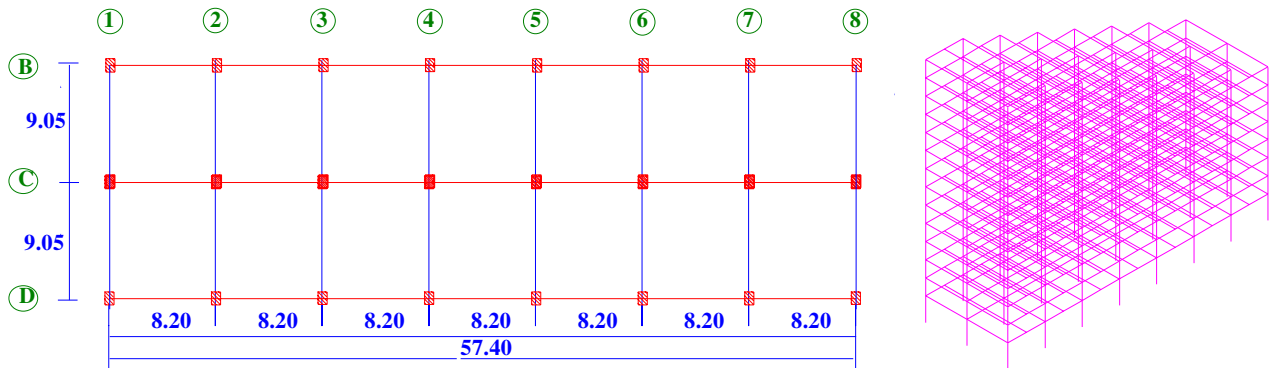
Plan and 3D ETABS model for IR2C building (dimensions in meters).
